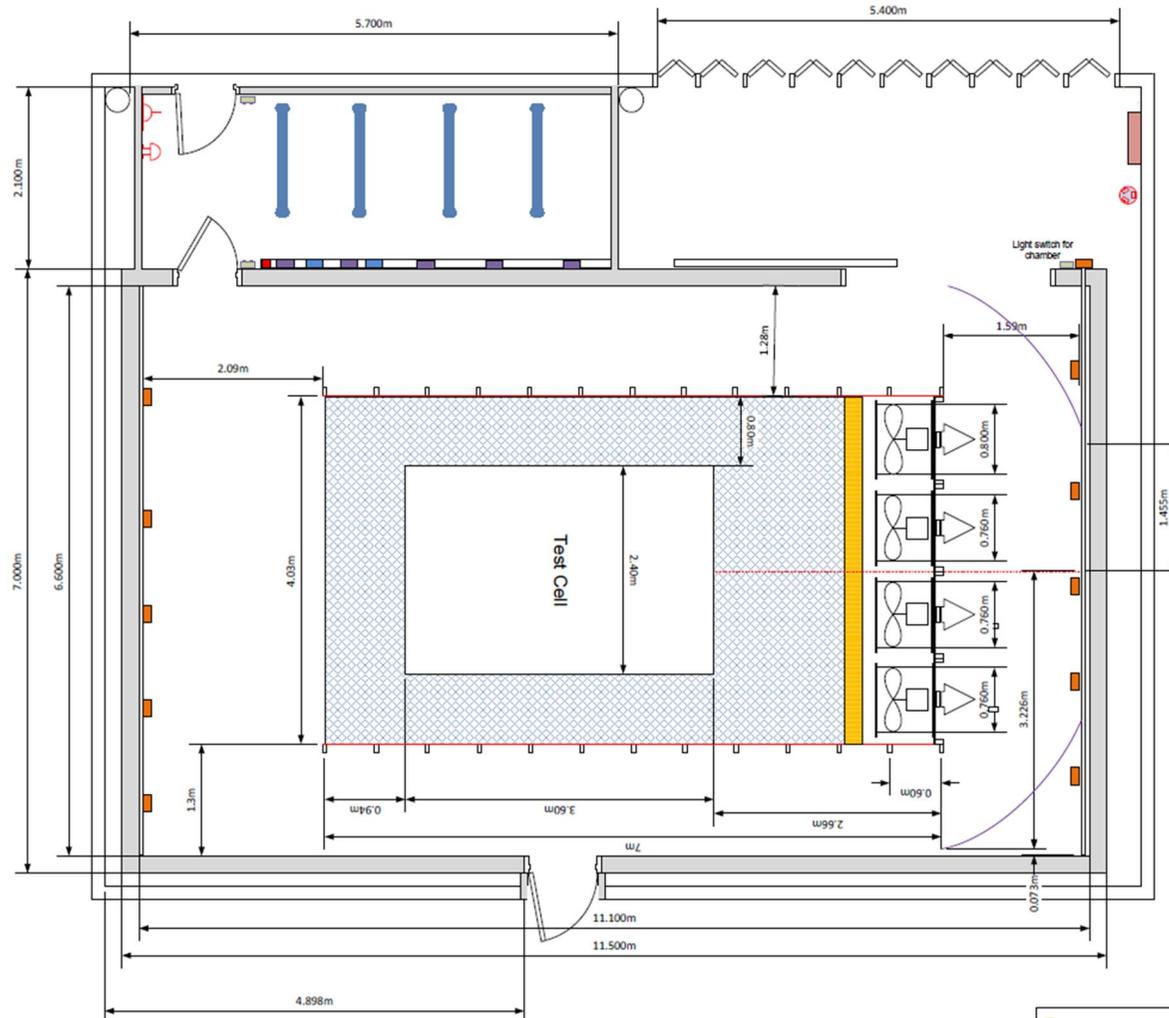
Test chamber – Plan. Details of tests chamber configuration with test room and ‘wind’ fan locations
